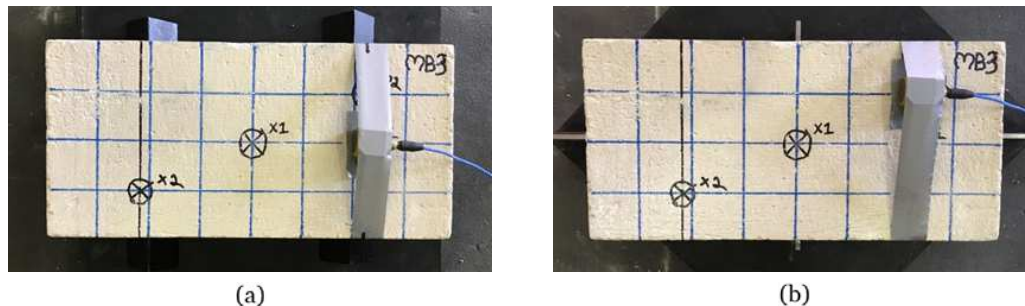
Accelerometer mounting using scrim-backed adhesive tape for (a) flexural test set-up and (b) torsional test set-up of IEV tests.
